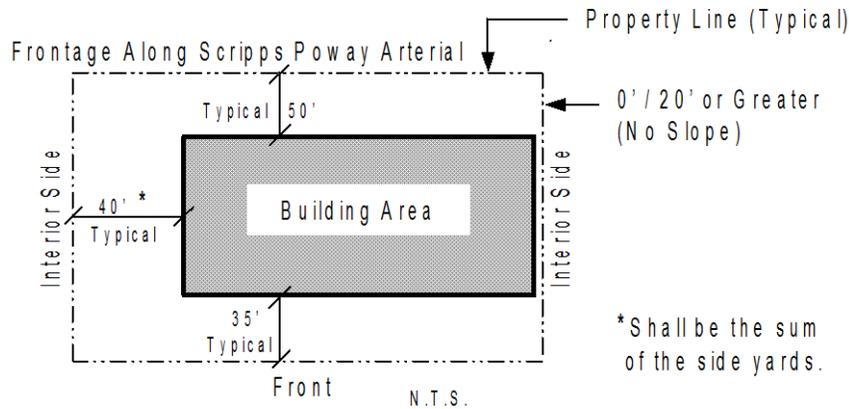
BUILDING SETBACK – PARCEL ABUTTING SCRIPPS POWAY PARKWAY
